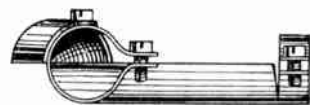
A "GRIP" INSPECTION BEND FITTING FOR PLAIN JOINT CONDUIT.
